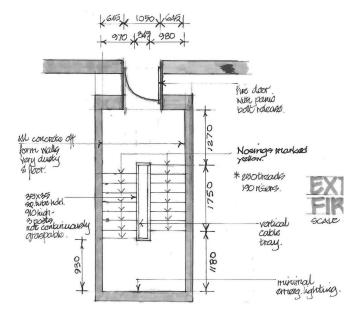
Dirty or External Stair – Building M3 – Plan View
